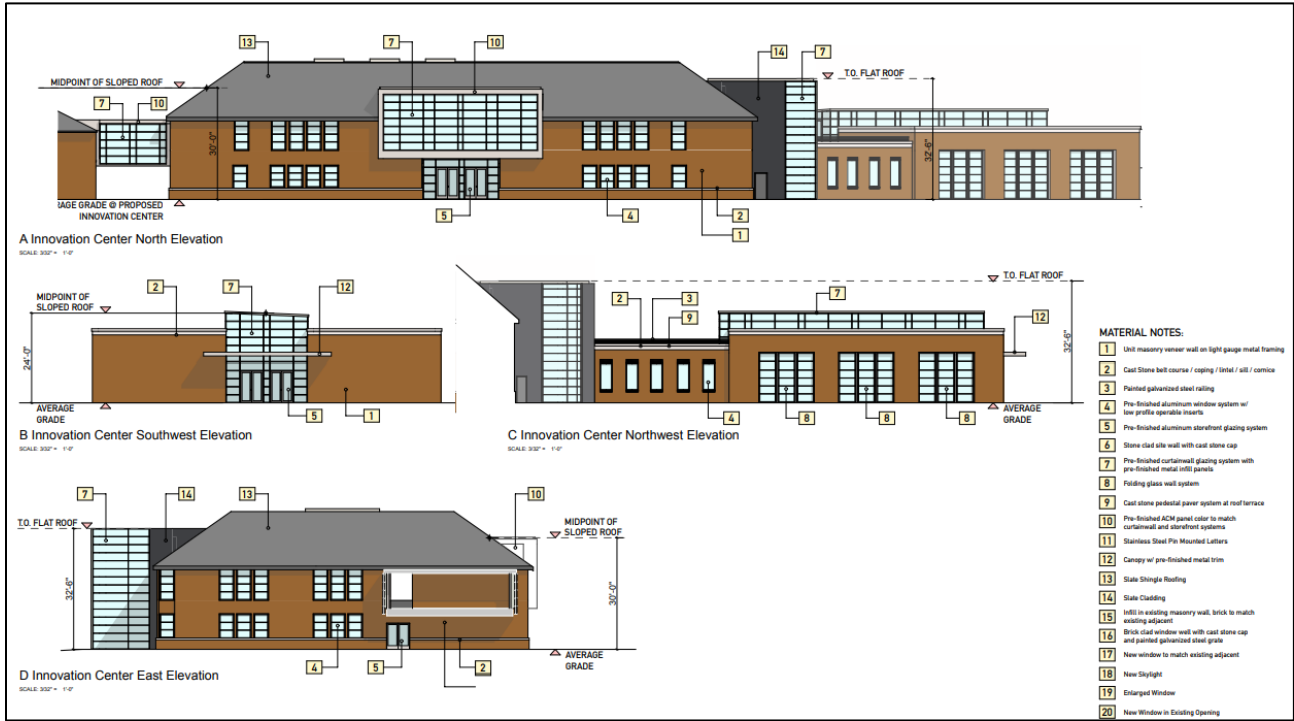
Innovation Center North, Northwest, Southwest, and East Elevations
